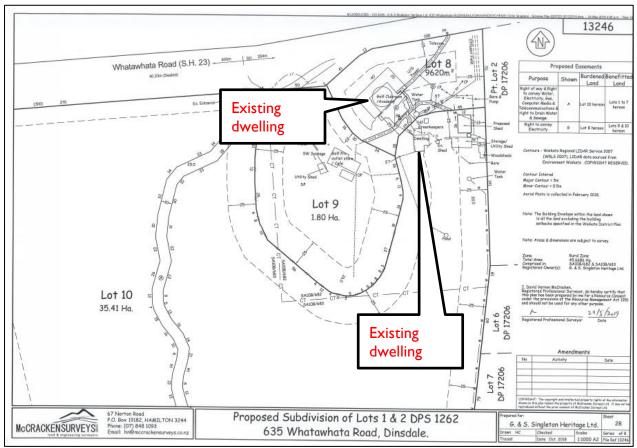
Location of existing dwellings on Lot 8 & 10.
